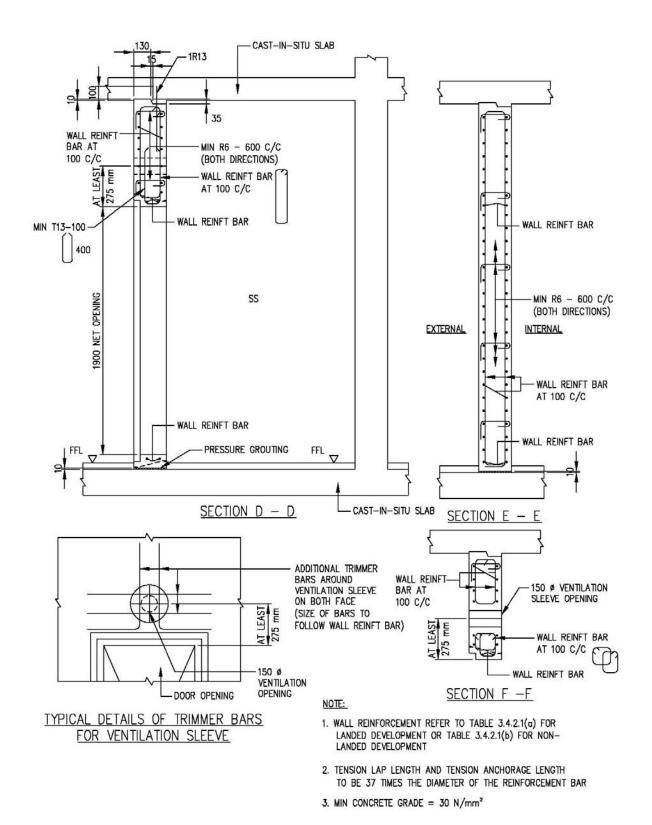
(g) DETAILS AND SECTIONS OF PRECAST DOOR FRAME PANEL WITH VENTILATION SLEEVE ABOVE IT (TYPE 2)
